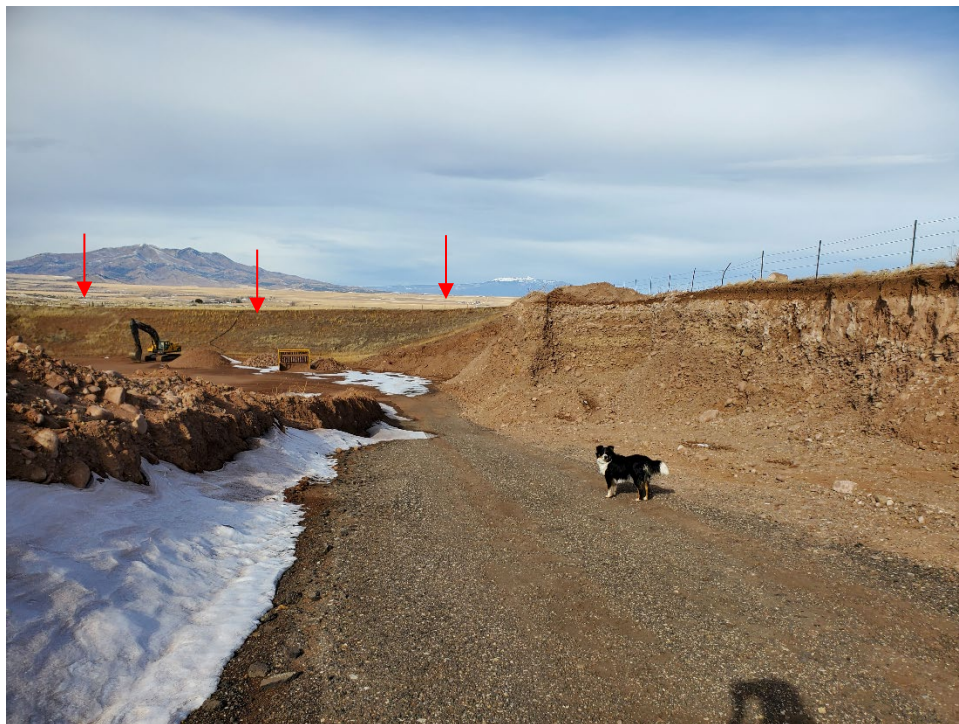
Looking north along the east highwall. The arrow points to the reclaimed northern slopes.
